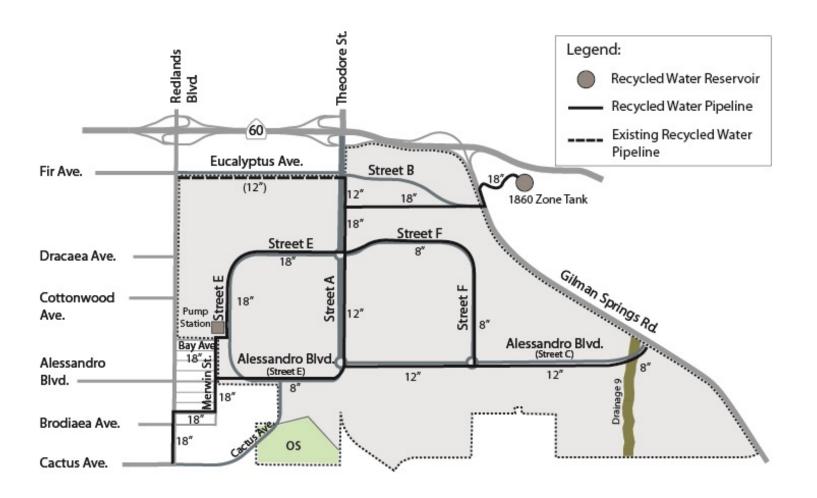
Recycled Water Plan (pg.3-18)
